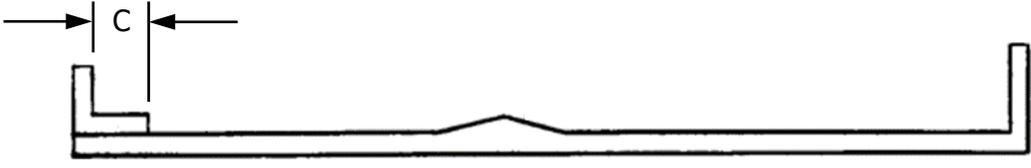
Cross-section view of a bridge deck with multiple median barriers.
